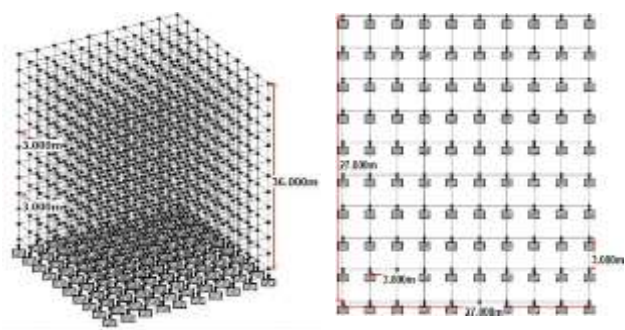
3DELEVATION AND PLAN OF RECTANGULAR BUILDING
